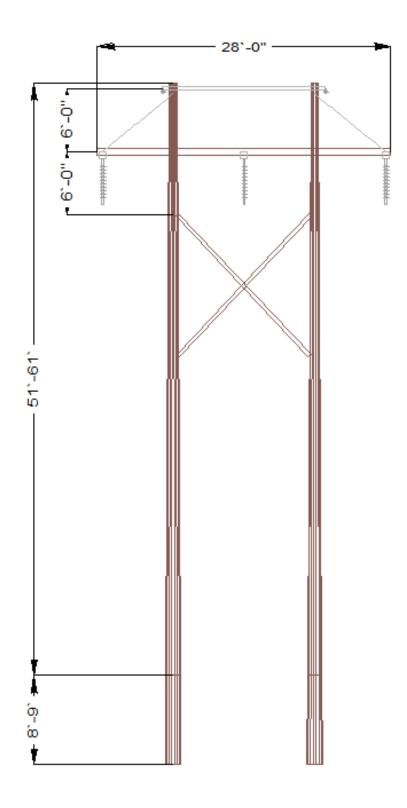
Proposed Route Rebuild Single-Circuit 138-kV Wood H-Frame Structure
